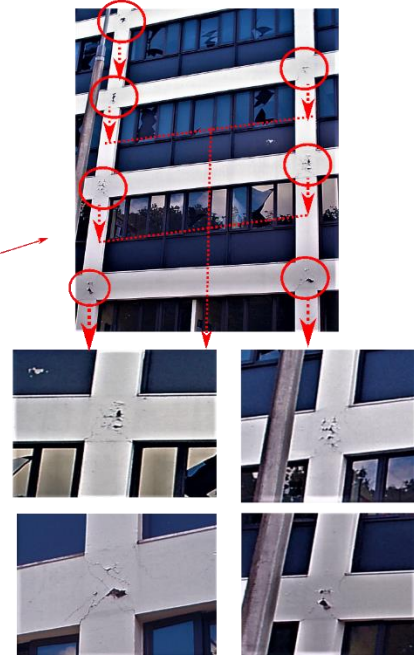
Failures from the real building [Courtesy of A.S Tasligedik 2011]
